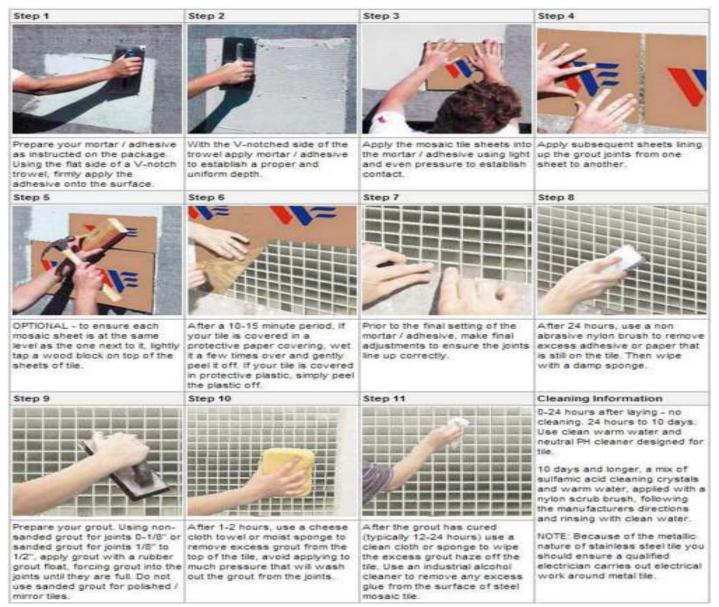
10 Steps to Fixing decorative mosaic tile for walls and floors
